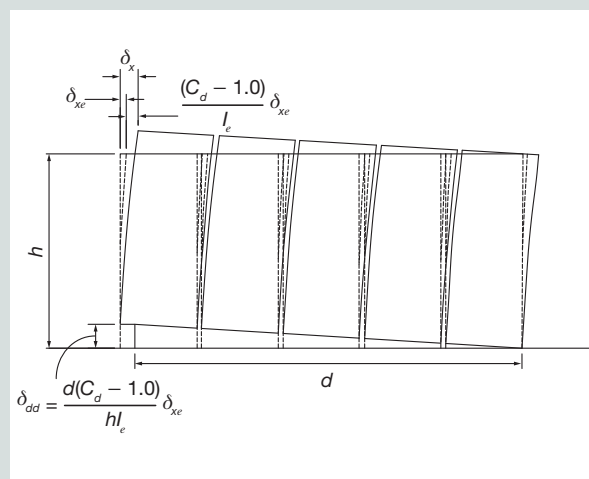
Rigidly connected series of intermediate precast concrete shear walls.
